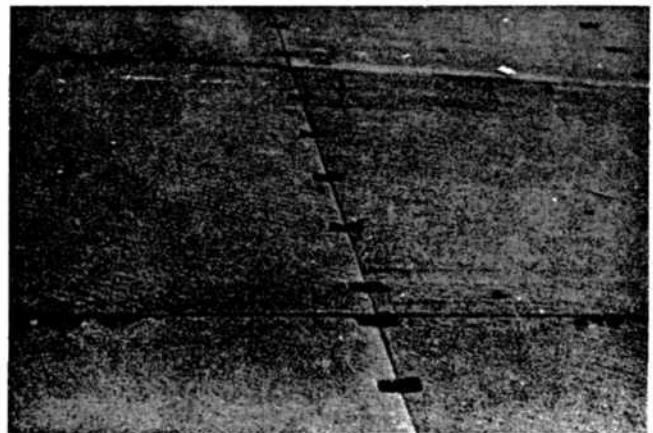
Epoxy and grit surfacing on prefabricated stiffened steel deck panels installed on the Strawberry Mansion Bridge in Philadelphia (1960)
